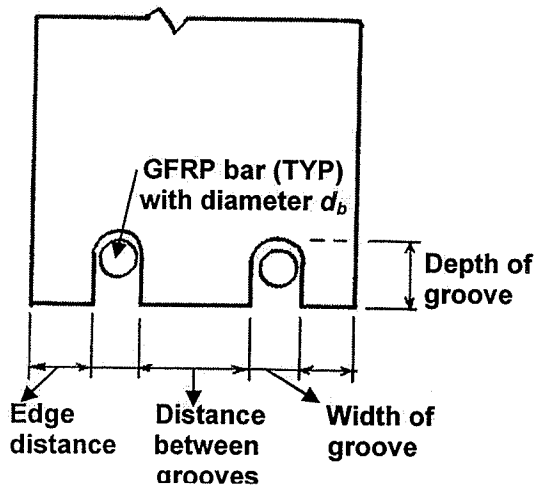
Cross-section of a timber beam with GFRP NSMR
